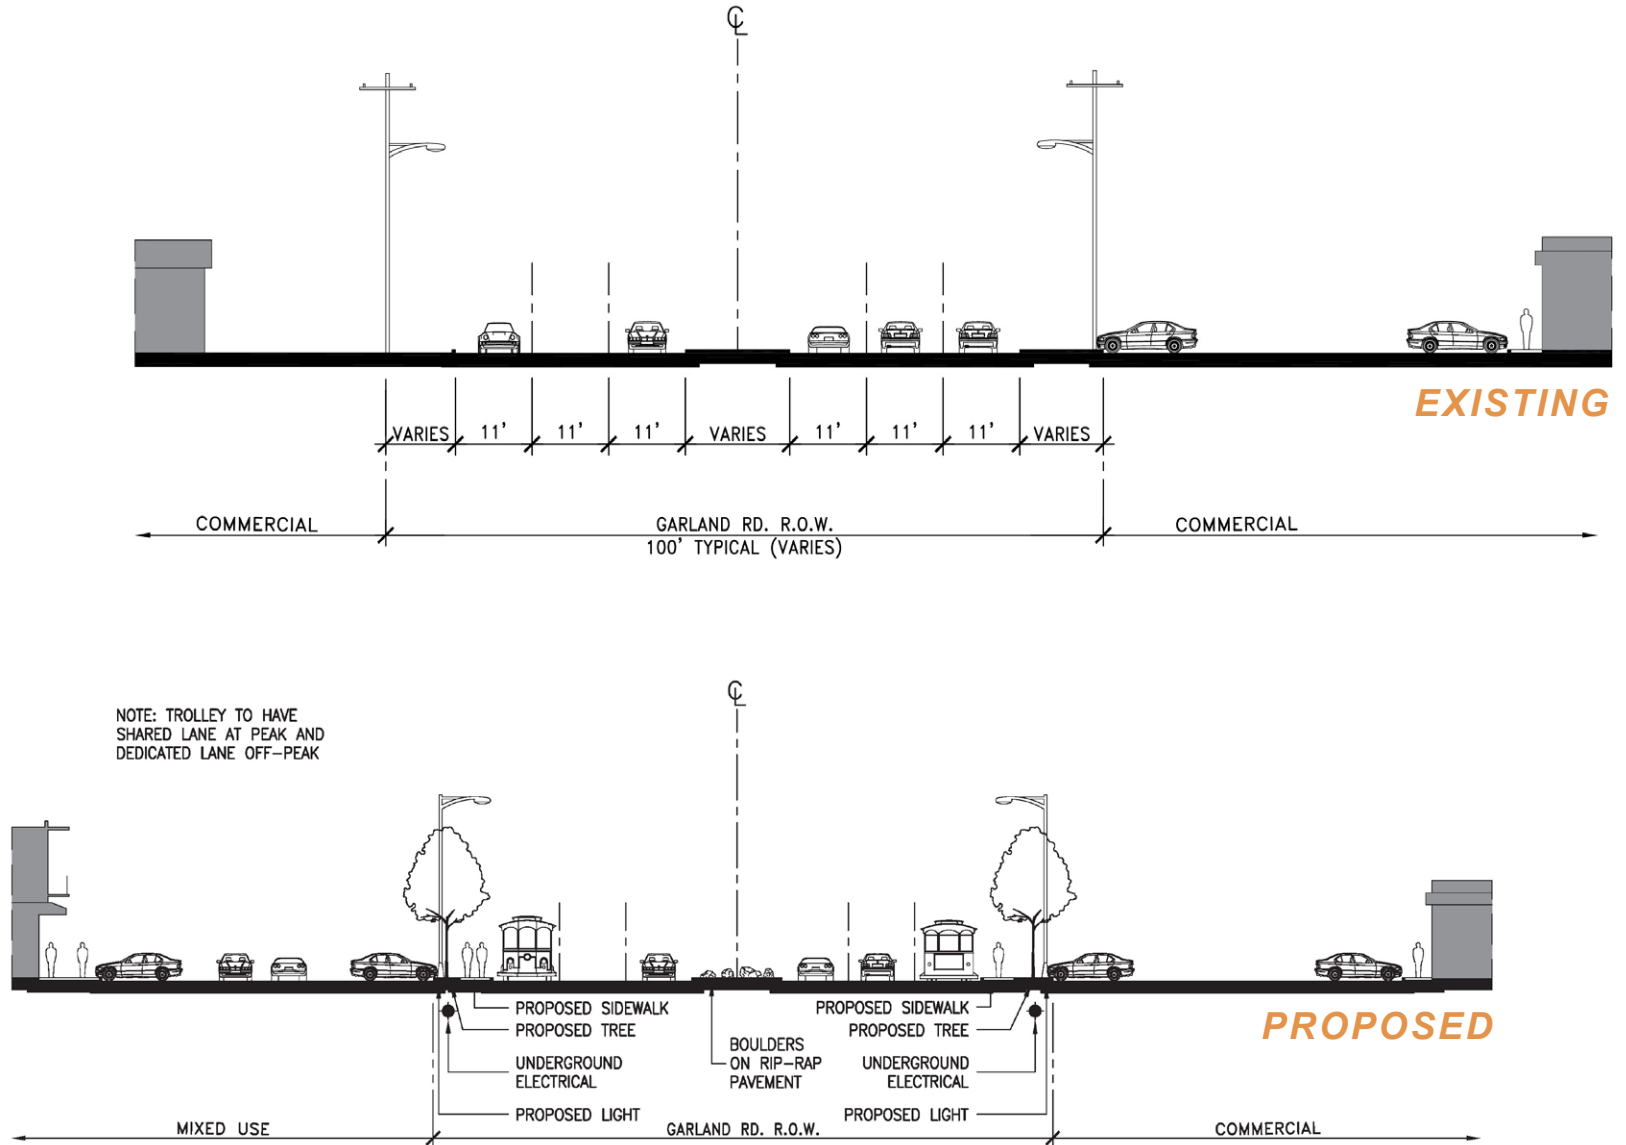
Section E: Garland Road and Lochwood Boulevard
